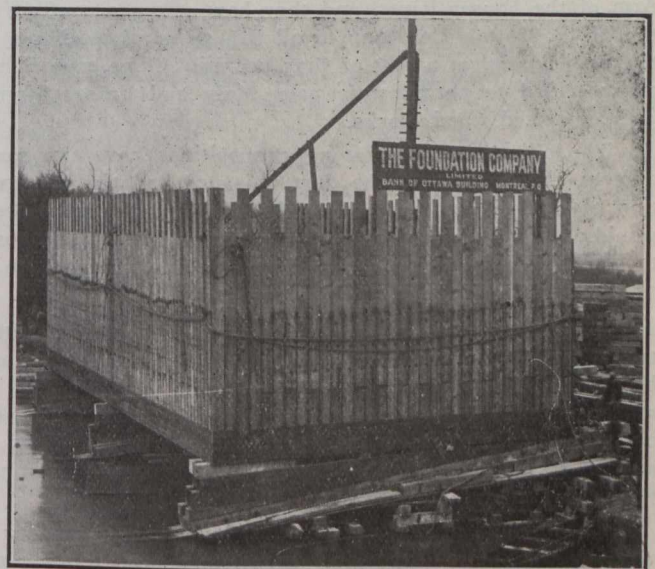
C.P.R. Pitt River Bridge Caisson No. 2, Ready for Launching.
